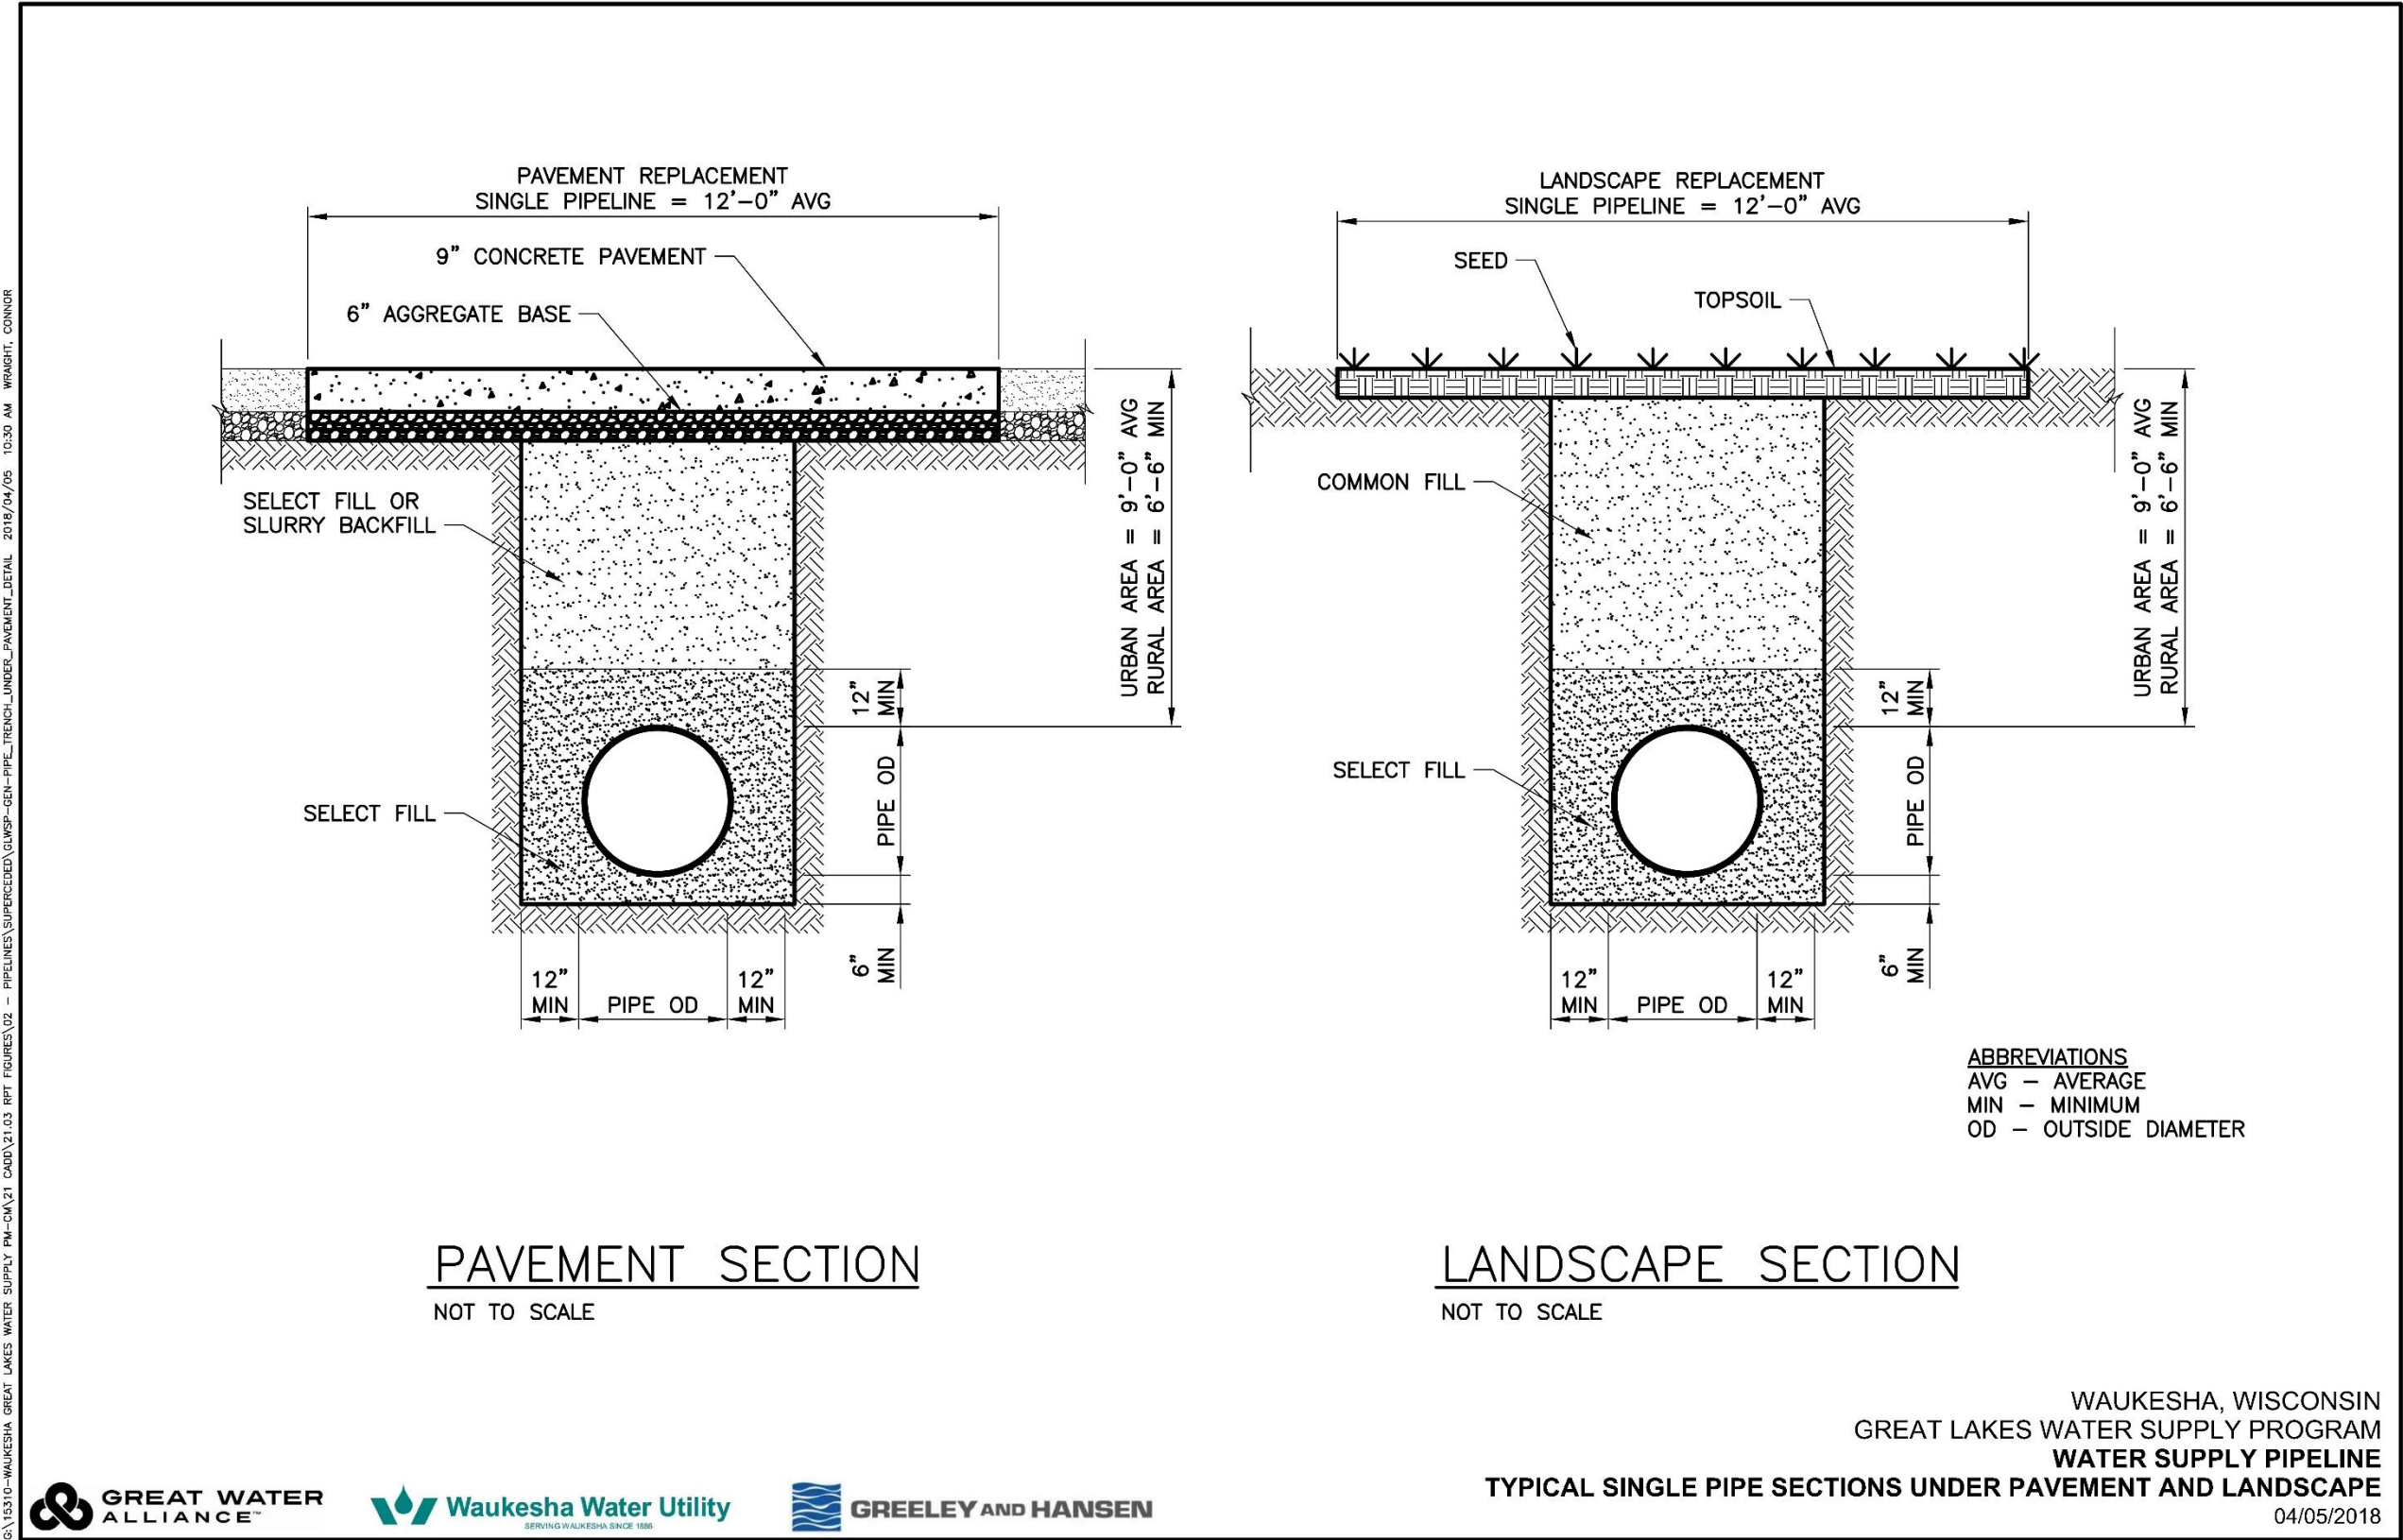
Typical Single Pipe Sections under Pavement and Landscape
